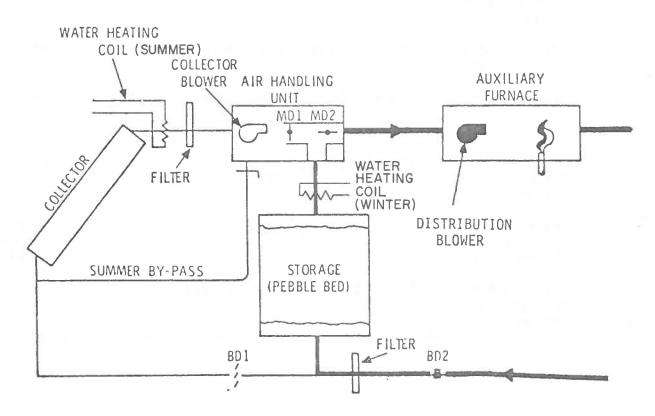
Heating Building from Storage Unit (Also Heating from Auxiliary)
